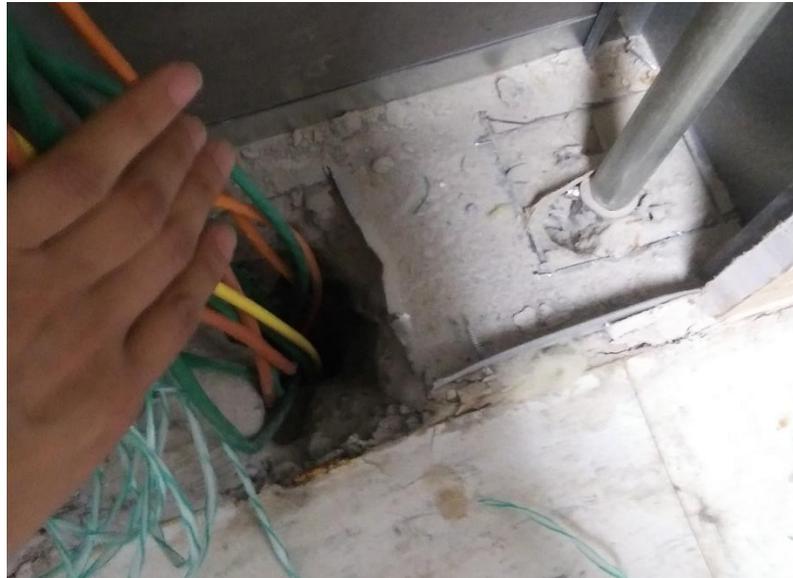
Hole in the floor between first and second floors showing existing cabling.
